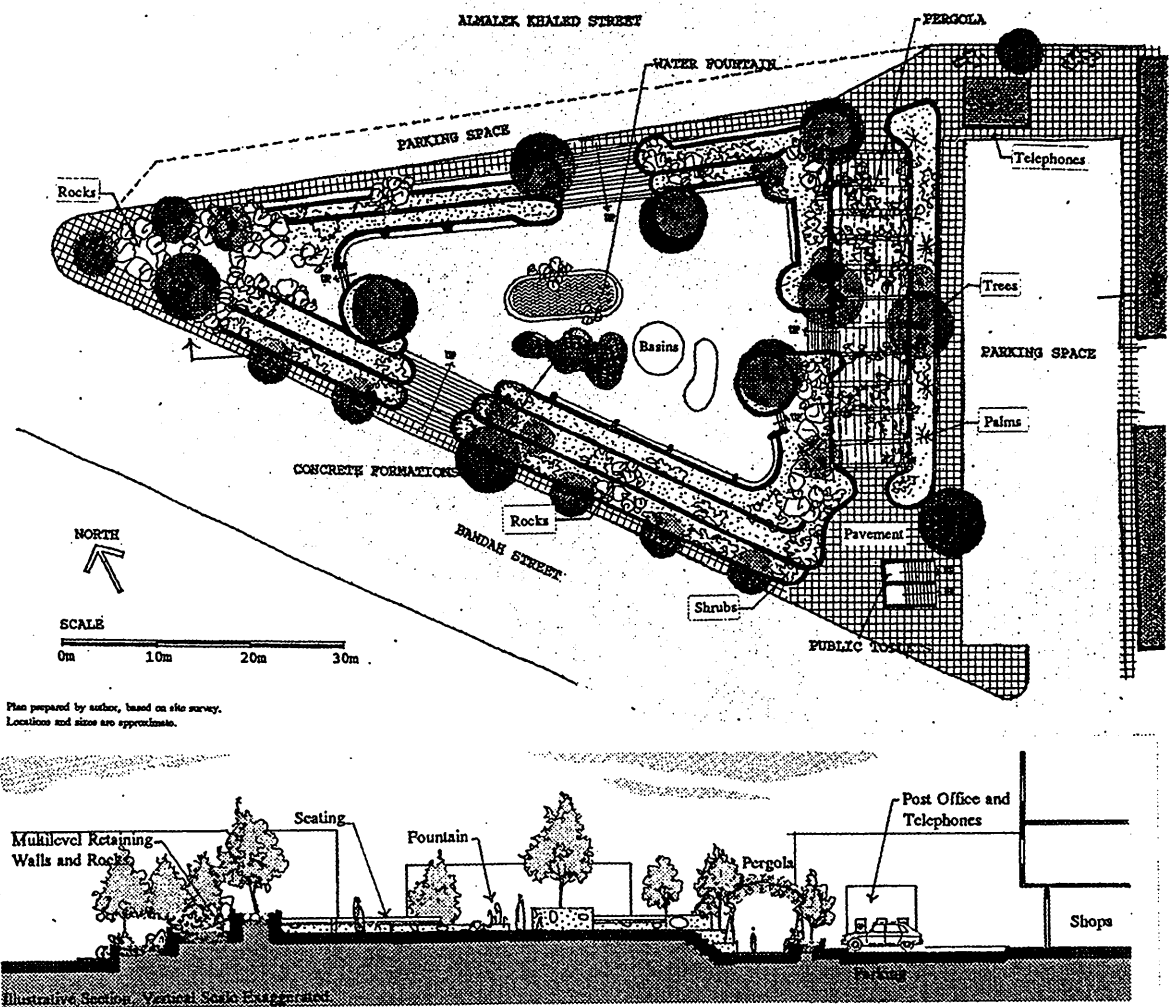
D): Illustrative plan and section for Al-Sharafeyyah Rock Garden.
